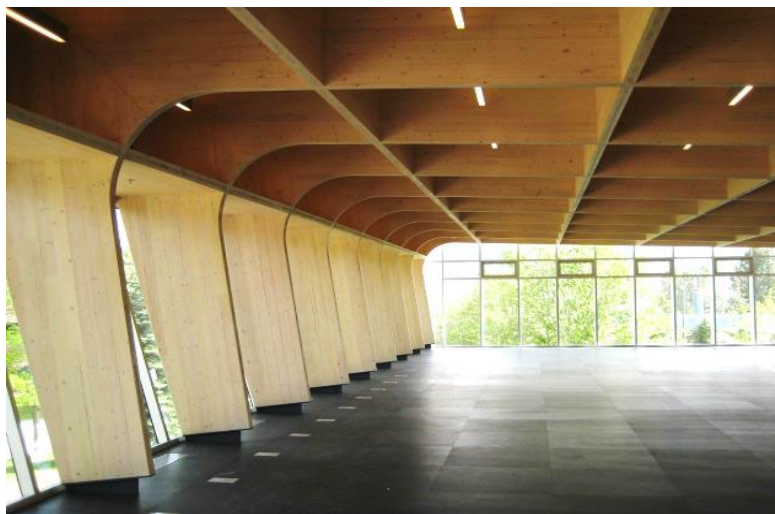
CLT moment frame using glued-in steel connections (courtesy of McFarland Marceau Architects).
